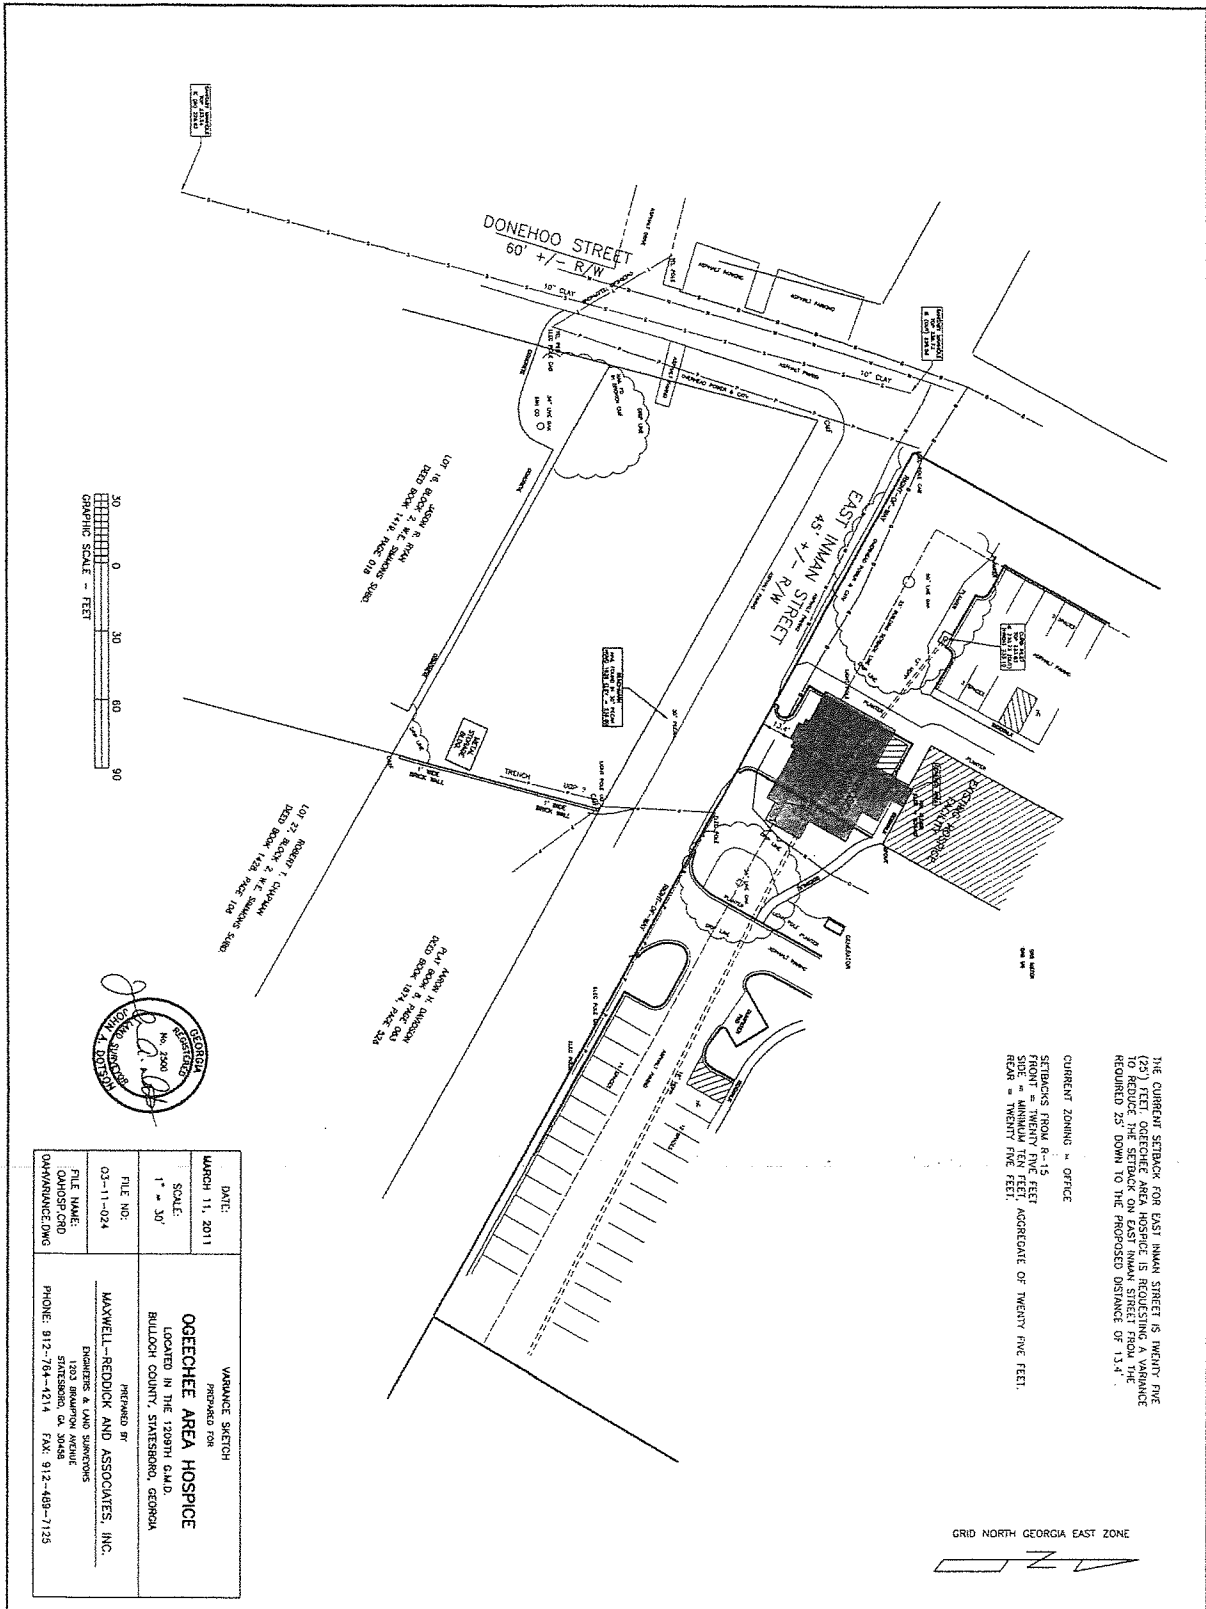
EXHIBIT F: RENDERING OF PROPOSED EXPANSION WITH PROPOSED BUILDING HIGHLIGHTED
